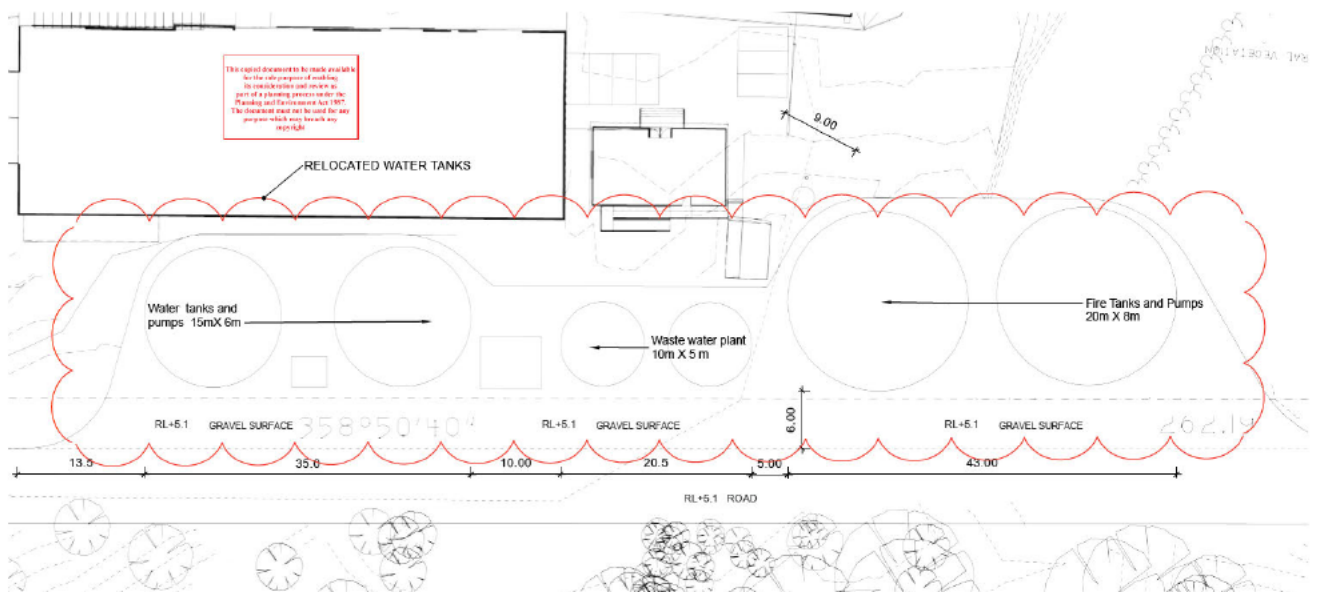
Proposed water tanks at 3 Lumeah Road adjacent to proposed vehicle access.
